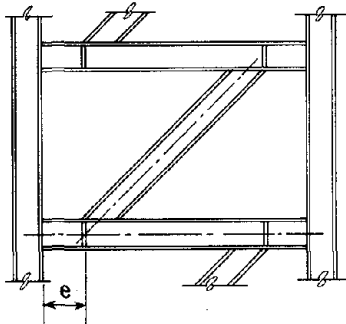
Typical Diagonal Eccentric Bracing [3].
